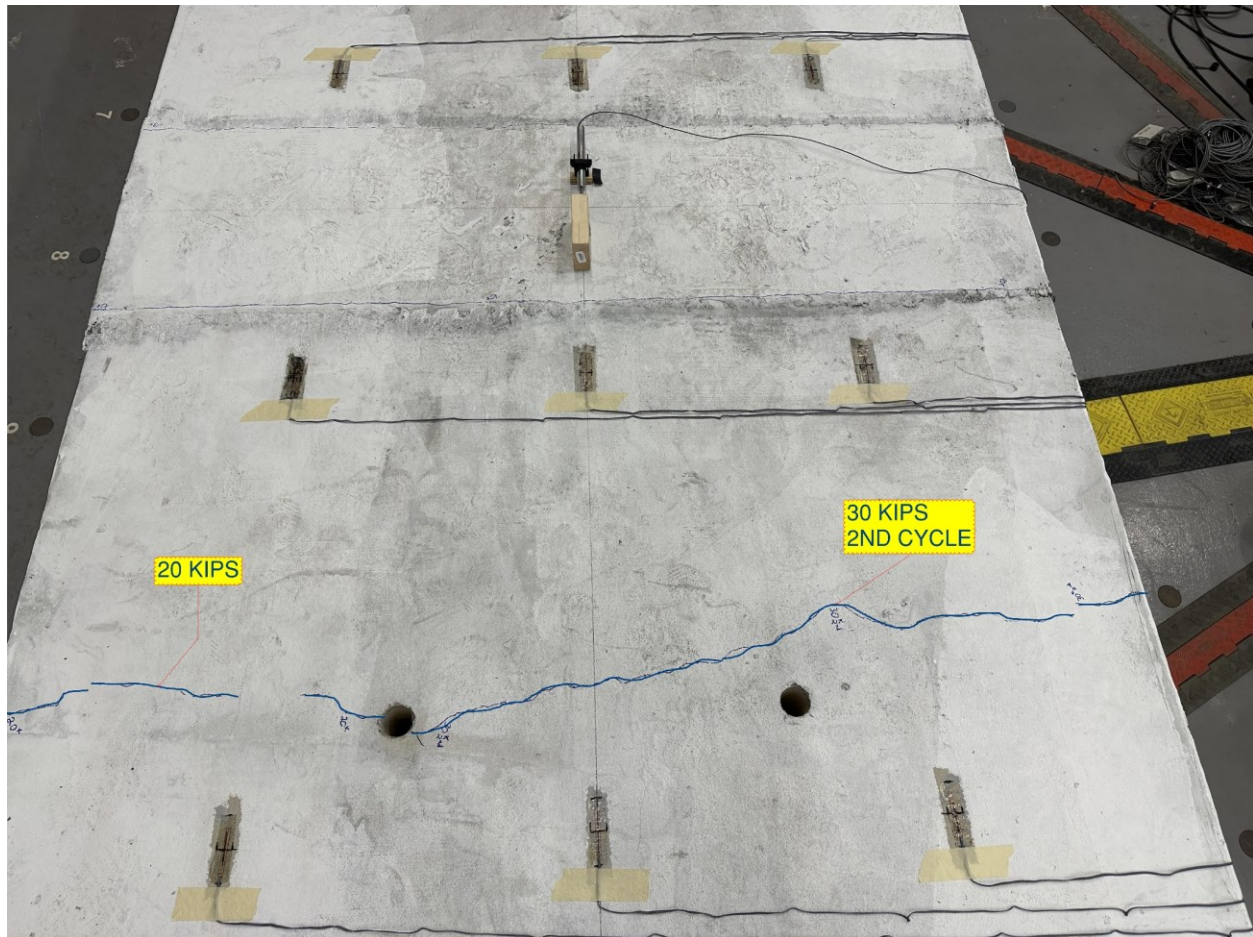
Concept C Static Testing Crack through Lifting Hole on Active Loading End.
